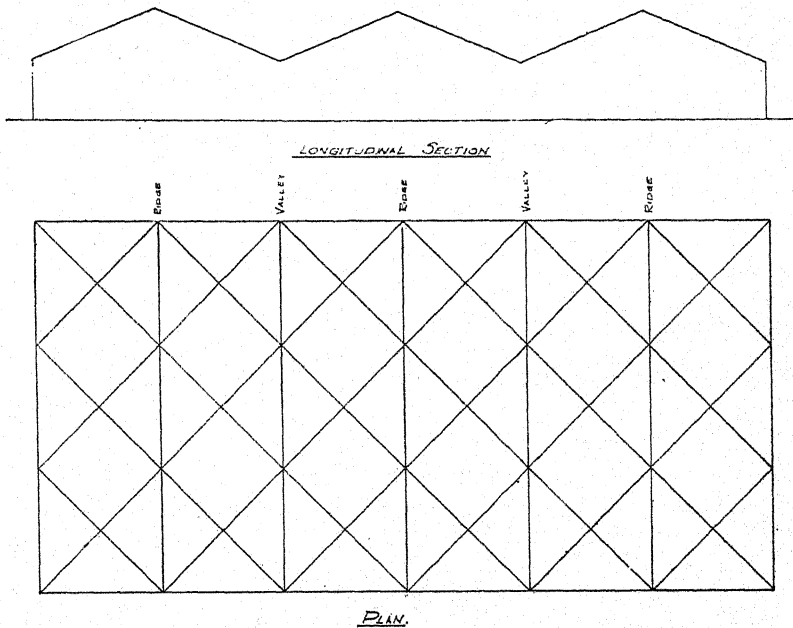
Multiple ridge and valley roof—longitudinal section.
